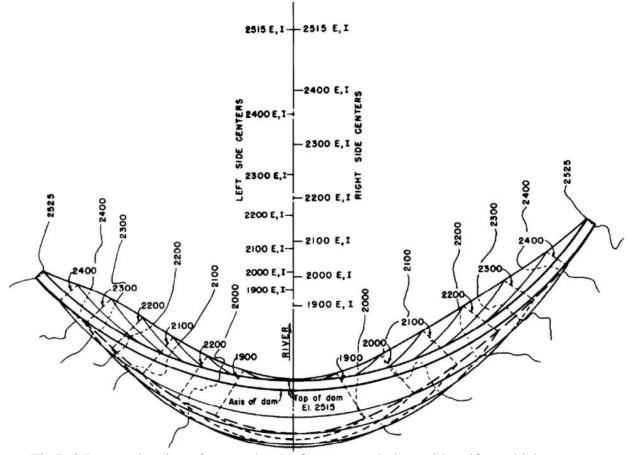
Layout drawing of a two planes of centers arch dam with uniform thickness arches
